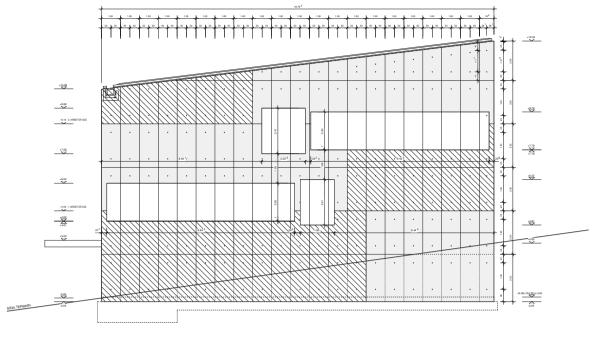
South elevation, formwork layout, 1:200 1:50 working drawing (reduced)
